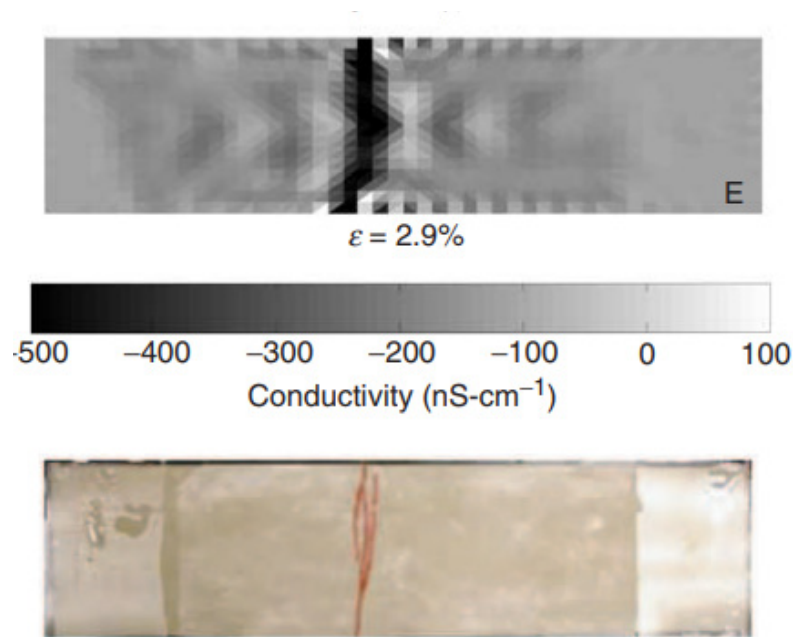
Top: EIT reconstruction of an ECC sample cracked under tension [48]. Bottom: The cracked ECC sample
